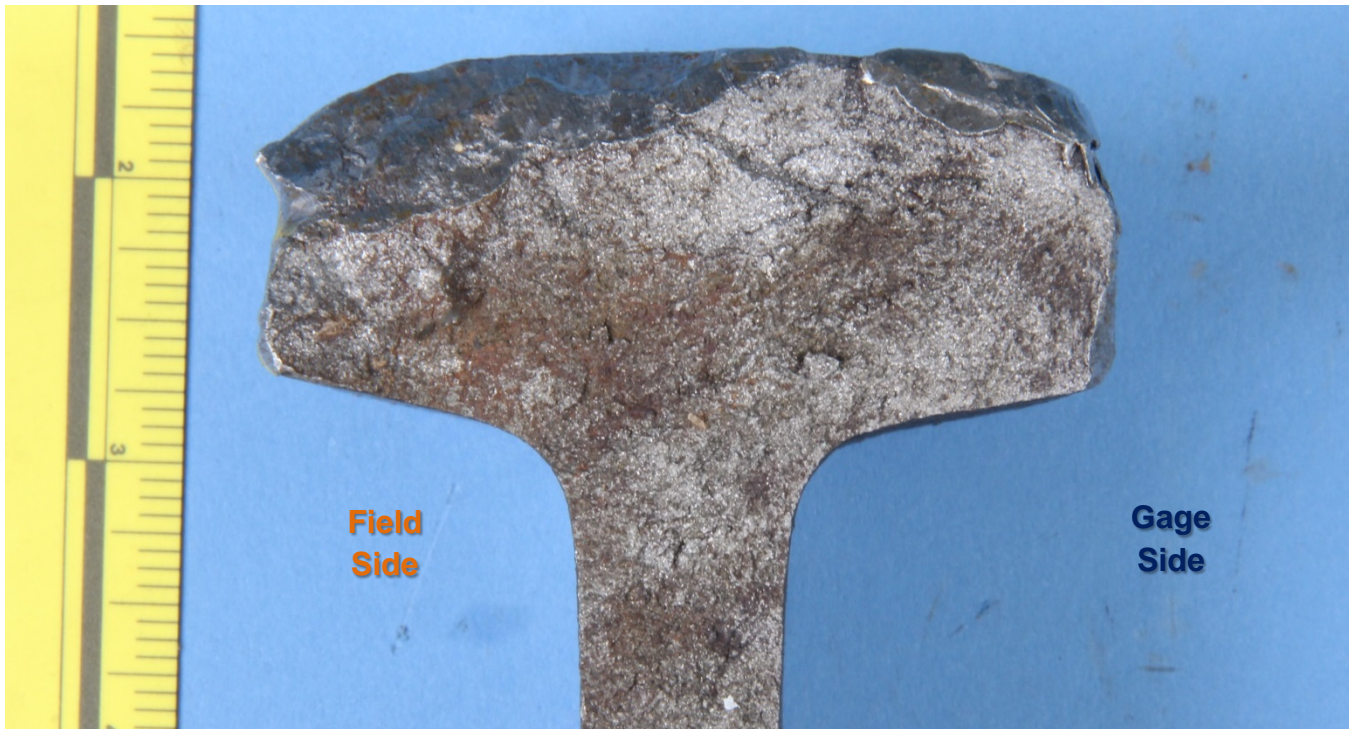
Closer view of the 12N fracture head from Figure 42 after cleaning, showing surface batter.
